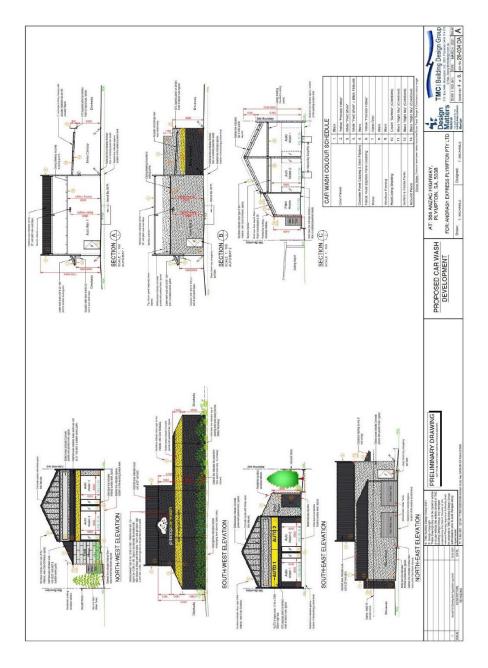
Proposed Elevations (source: TMC Building Design Group)
